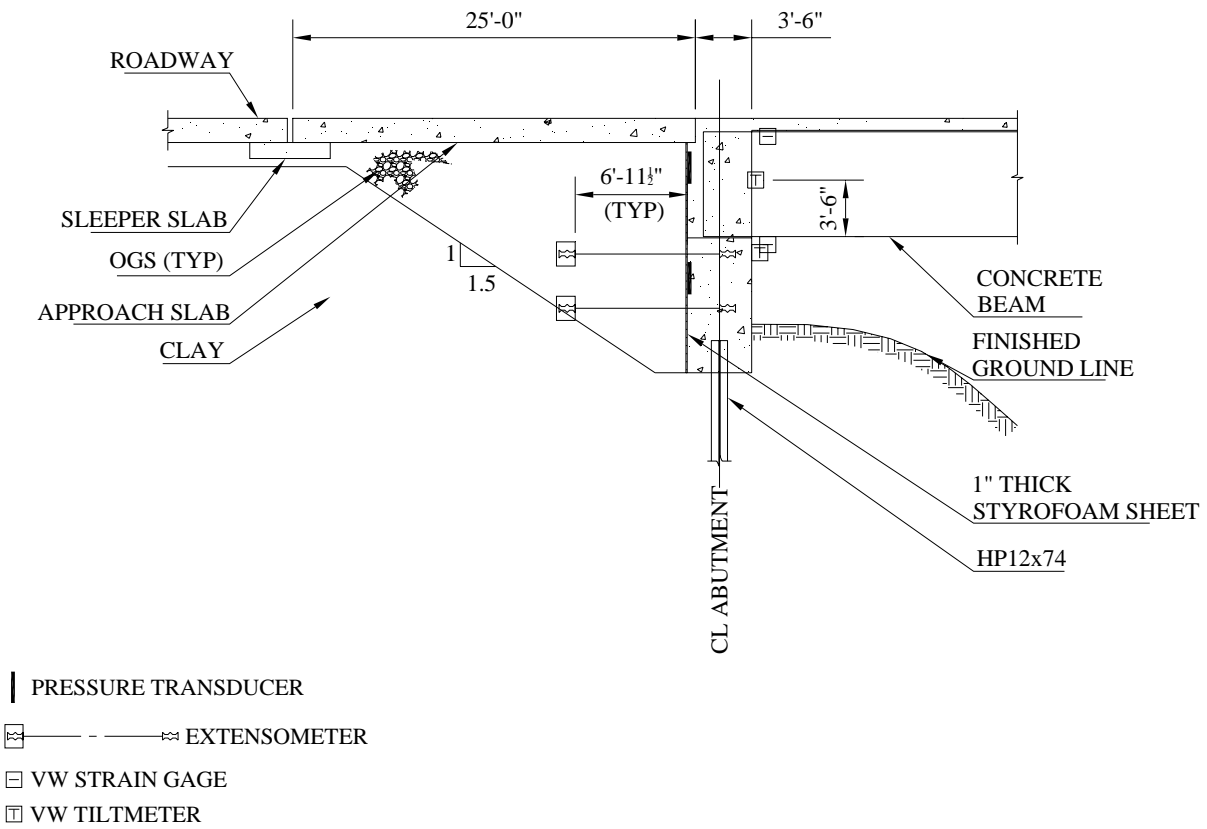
Structure 211 Cross-Section Through Abutment 2 (Section A-A).
